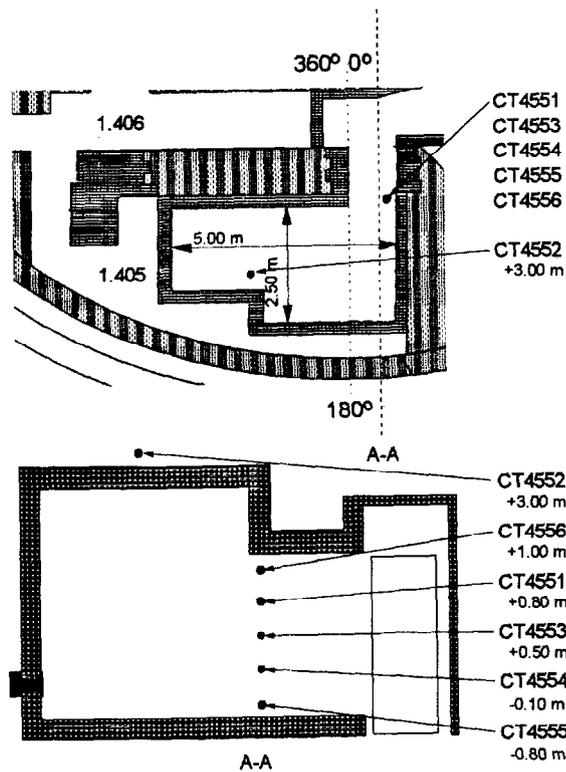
Fire Room Vertical Cross Section for T51.2
